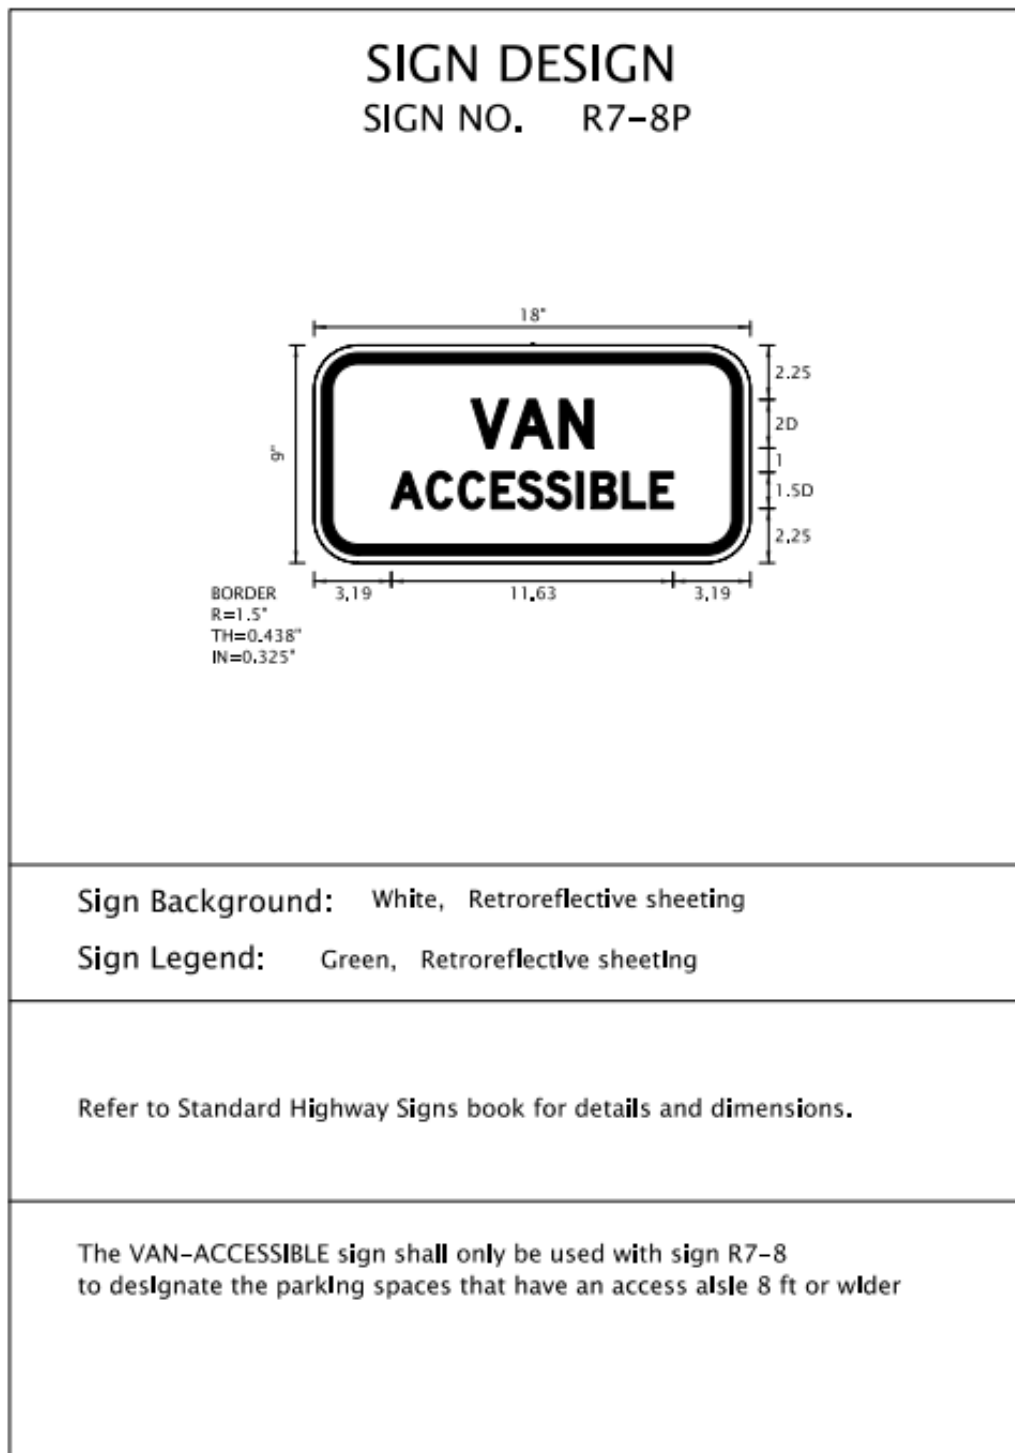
Sign design details for a sign rider to denote a van accessible parking spot
